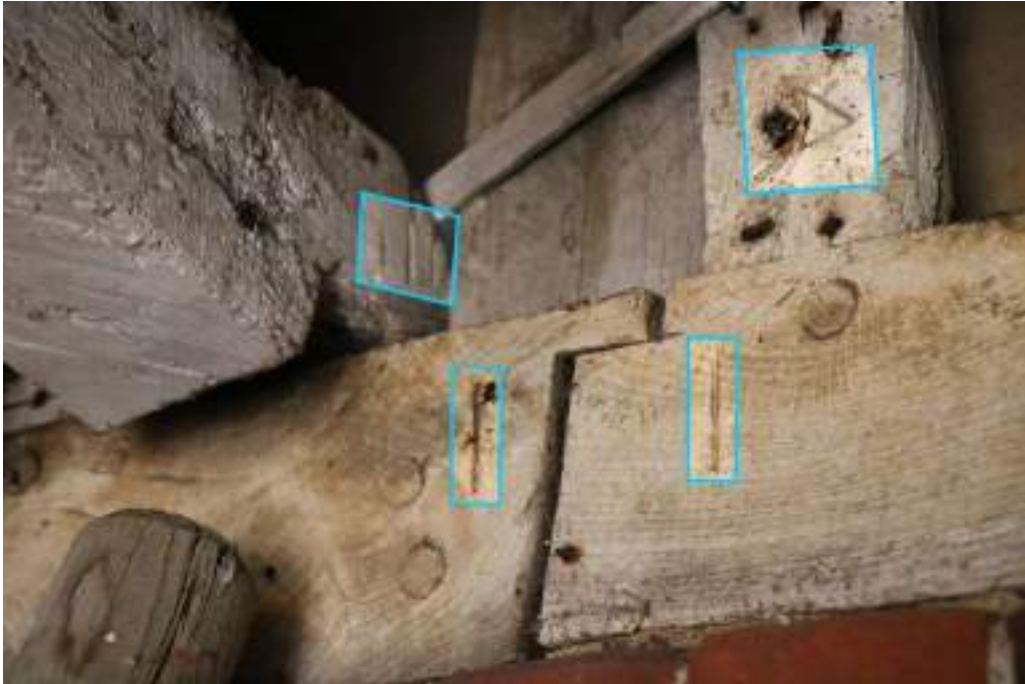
Interior of lean-to 2, showing lath and plaster wall. Sill-beam scarf-joint and carpenter's marks highlighted in blue. Photograph taken facing north-east.
